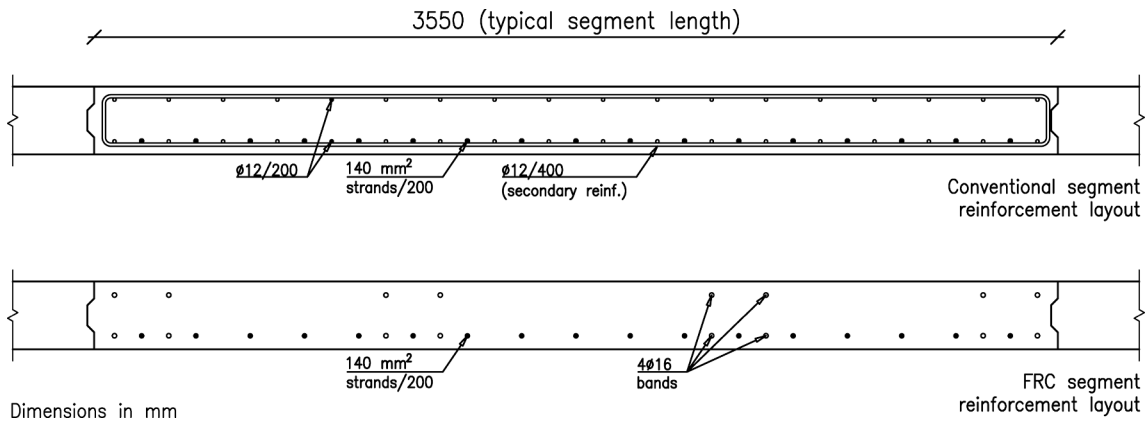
Transversal bottom reinforcement layout proposal for the Metrorrey typical segment (3.55 m). Transversal section-cut view.
